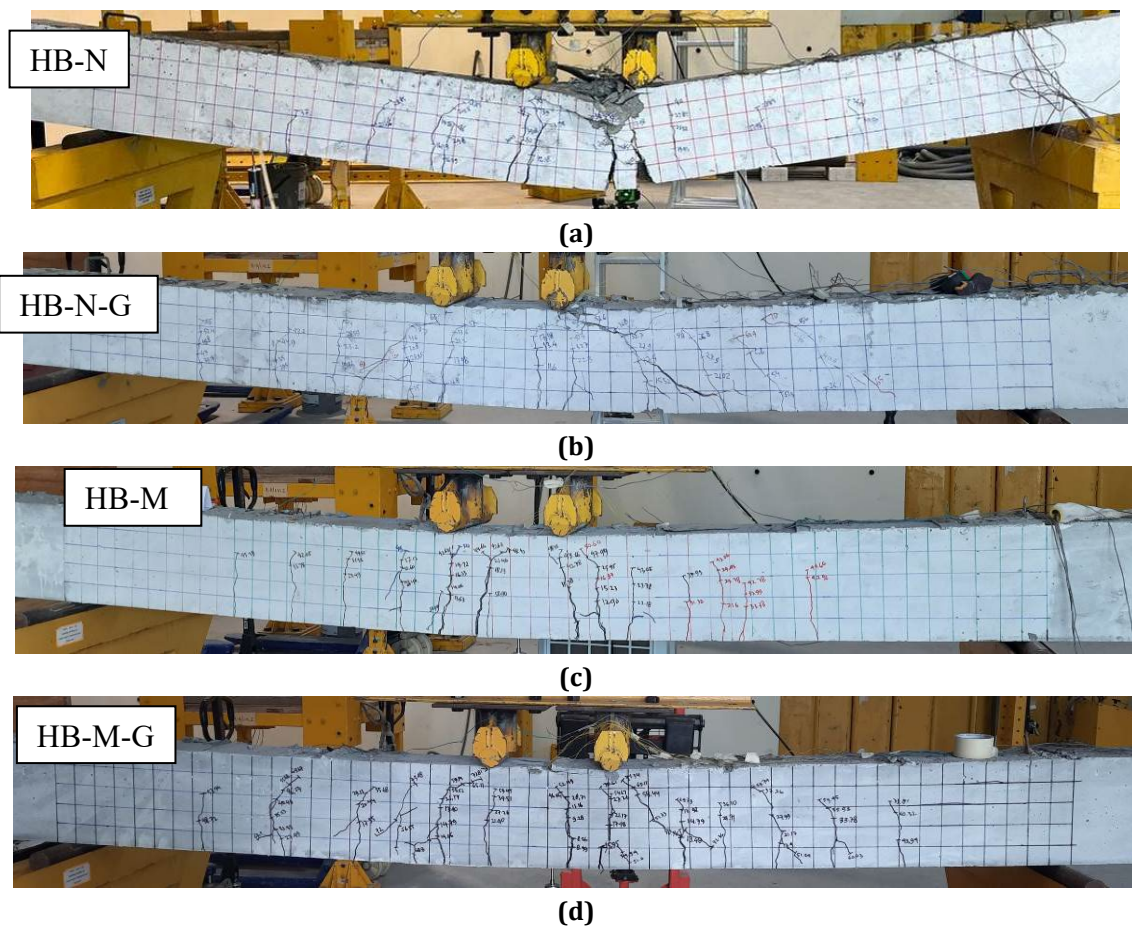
Failure modes of the tested beams (a) HB-N beam; (b) HB-N-G beam; (c) HB-M beam; (d) HB-M-G beam
